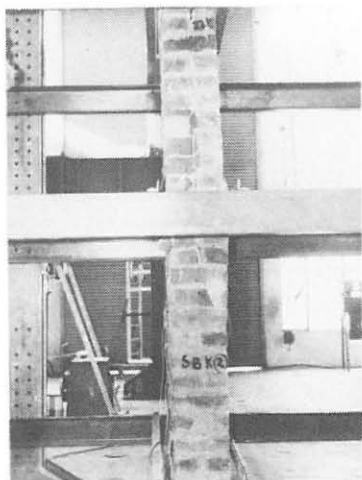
(c) TYPICAL VERTICAL SPLITTING OF WALL
